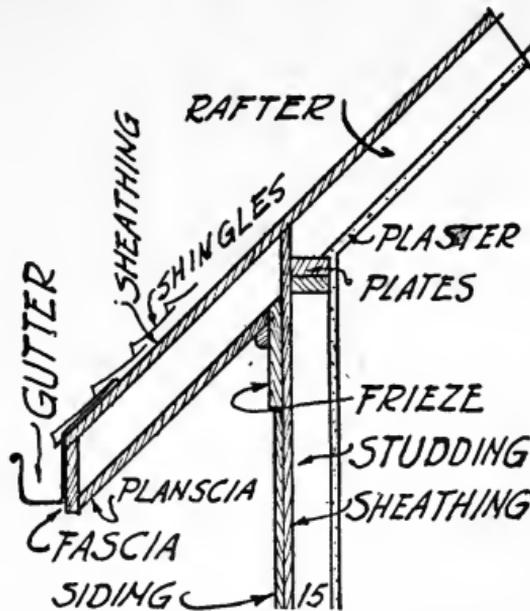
Detail Showing Side Wall, Eave Projection and Roof
